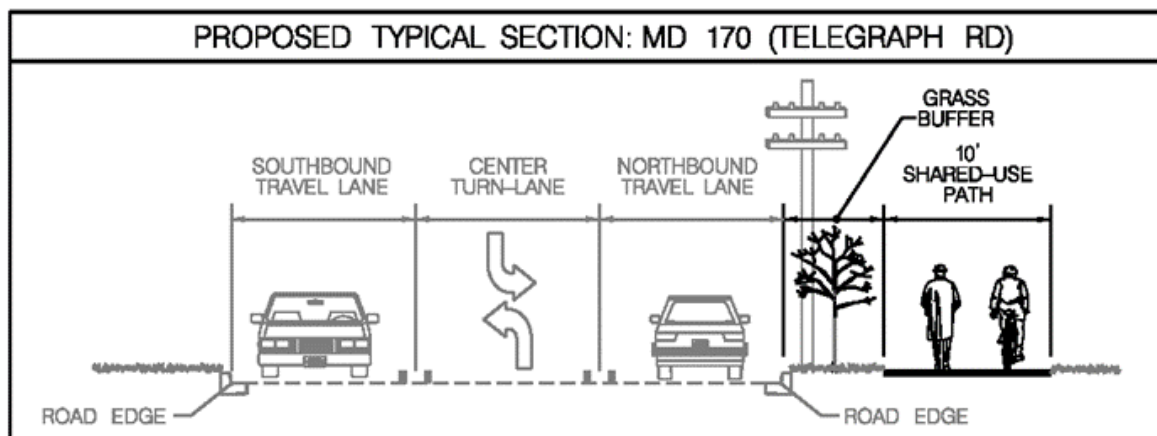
Proposed Typical Section along Telegraph Road (MD 170)
